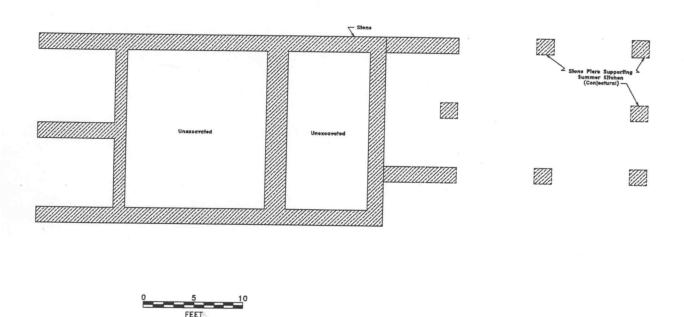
Basement and foundation plan of the Allard House, ca. 1860.
